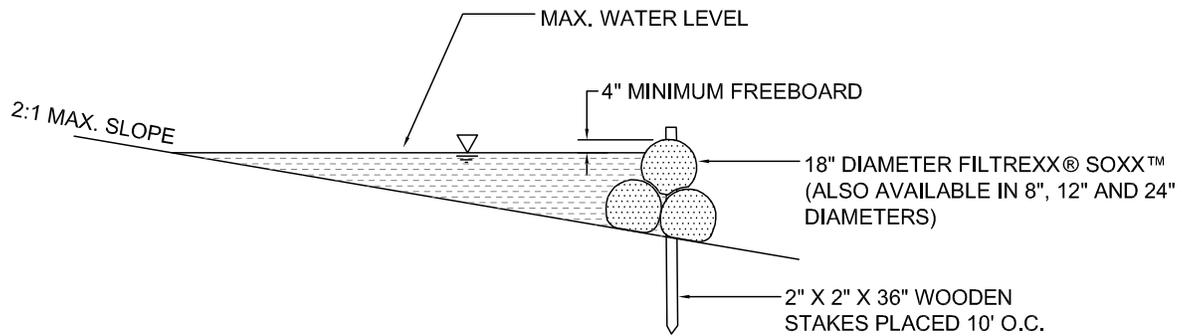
Engineering Design Drawing for Runoff Diversion - Sectional View
